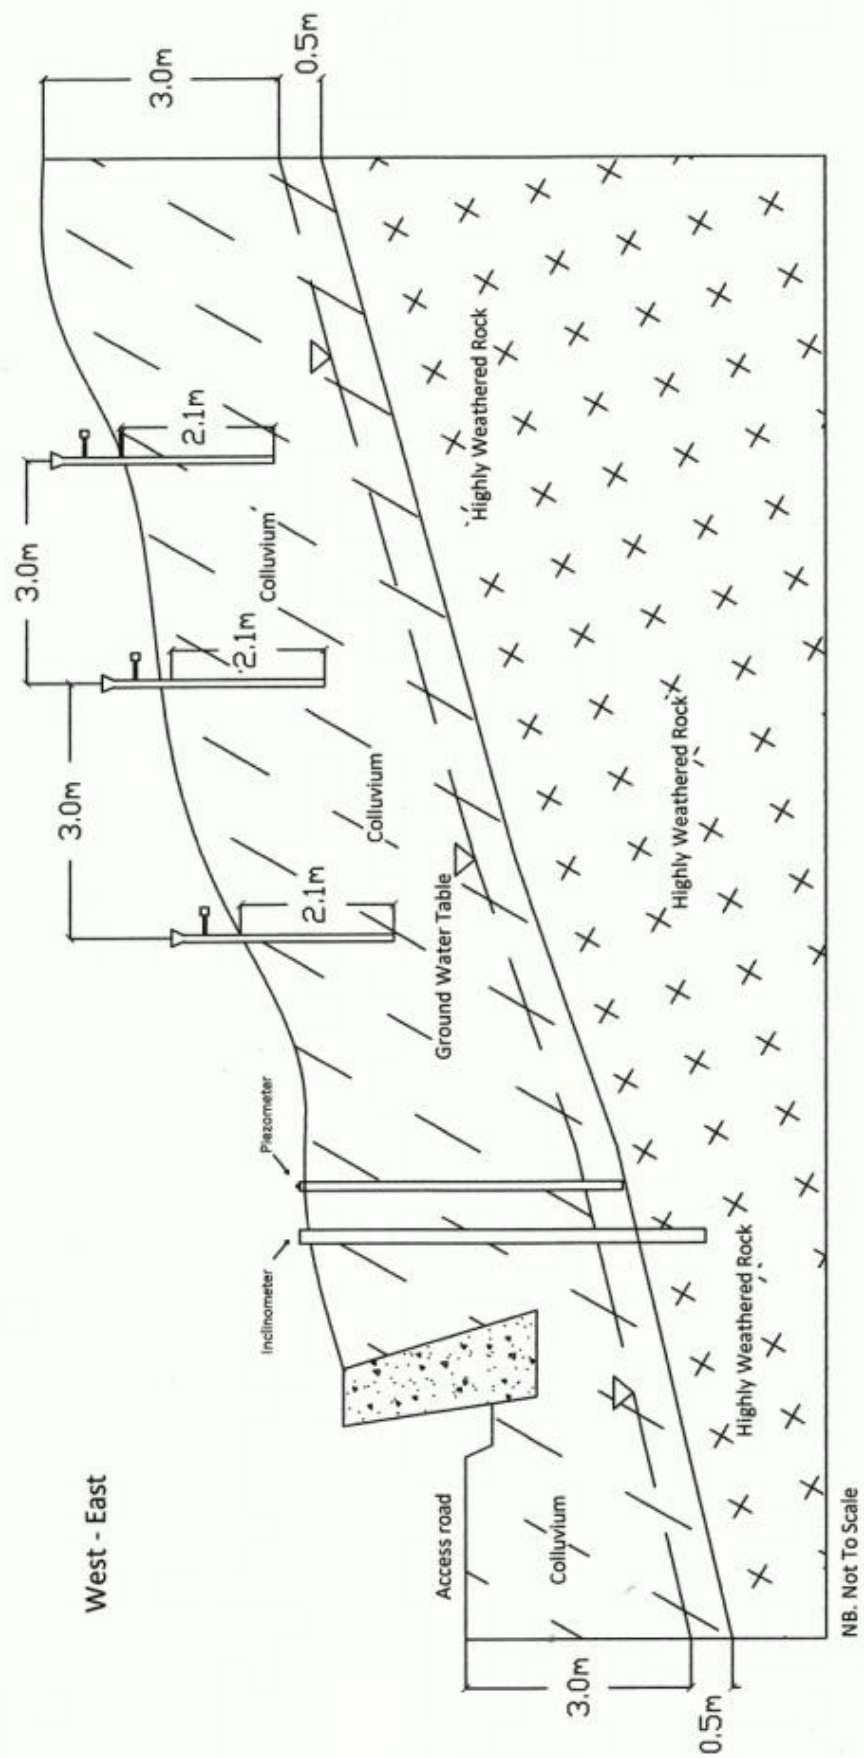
Cross Section of the slope with instrumentation at the Windjammer Landing Beach Resort Study Site
